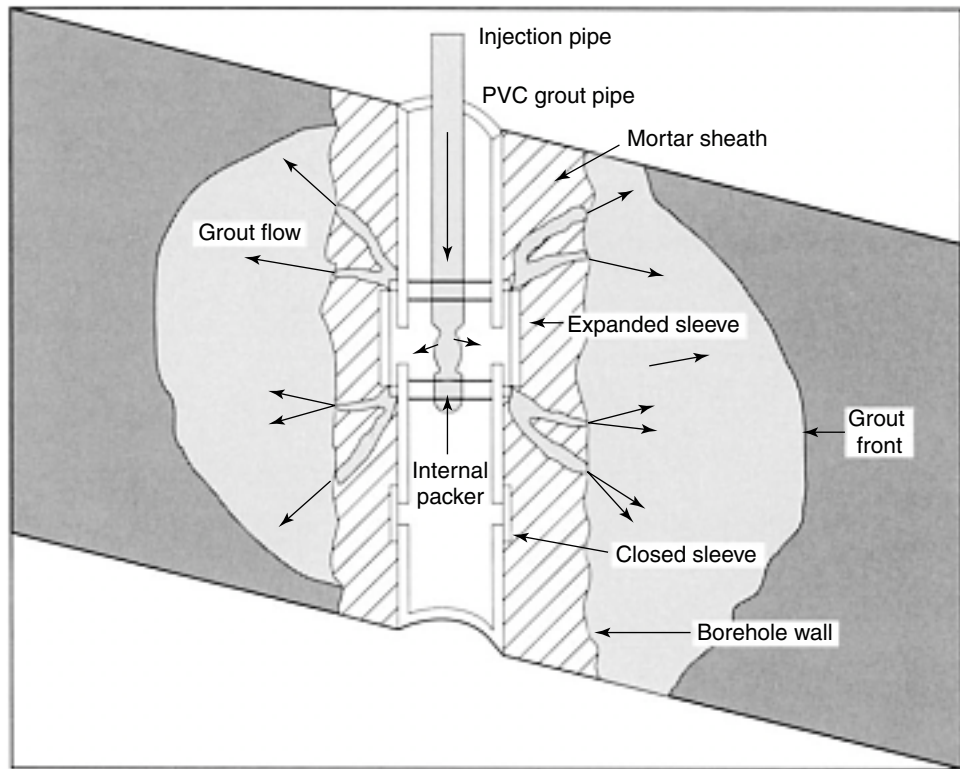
Grouting utilizing a sleeve port pipe. (Courtesy of Hayward Baker, Inc., A Keller Company)
